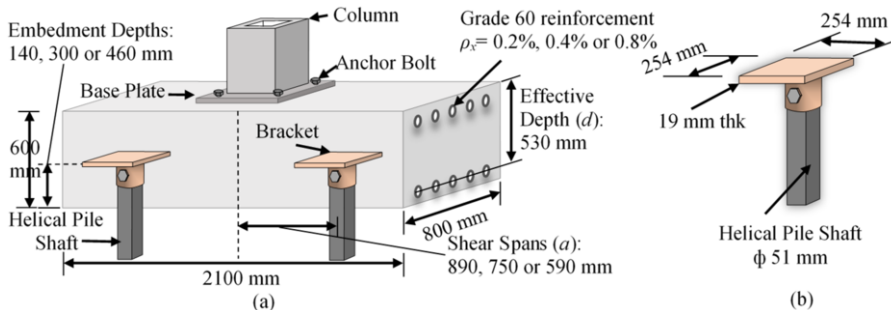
(a) Helical pile anchorage in the pile cap strip; (b) Details of single bracket.
